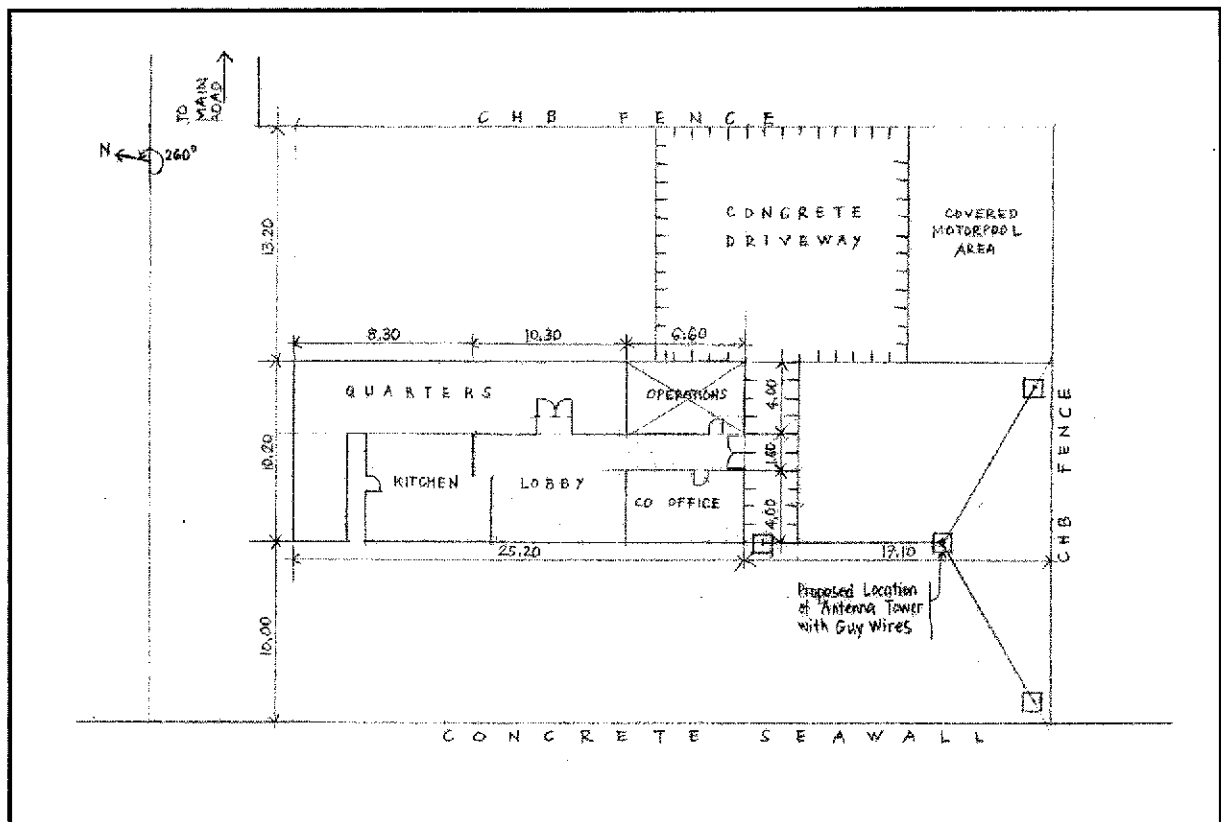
SITE LAYOUT FOR CGS SUBIC
